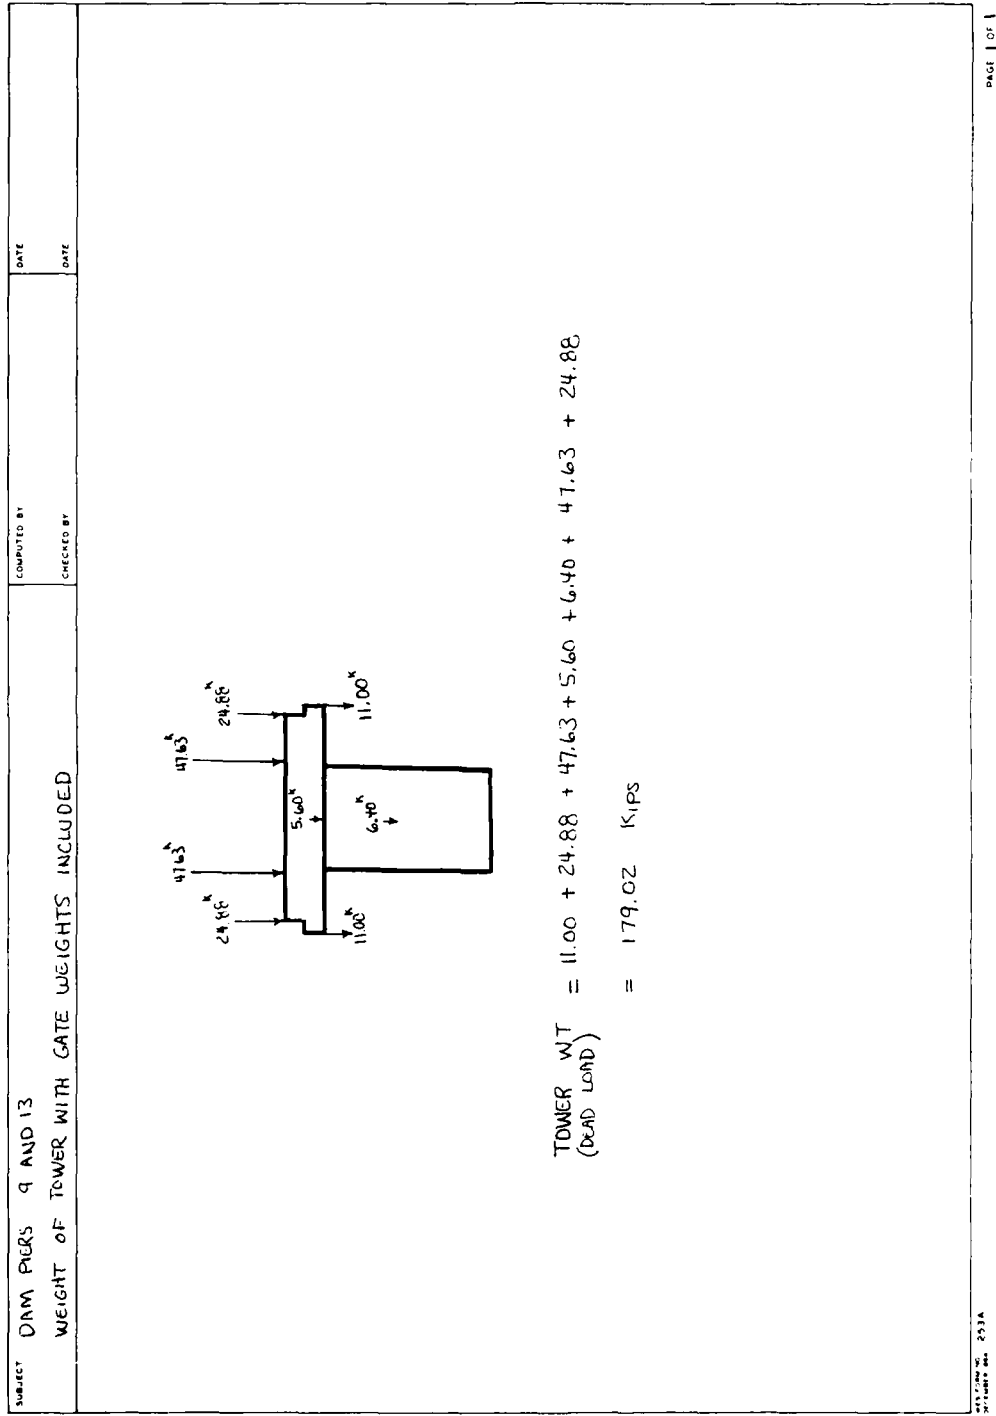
Weight of tower on pier, dam piers 9 and 13, Soo Dam
